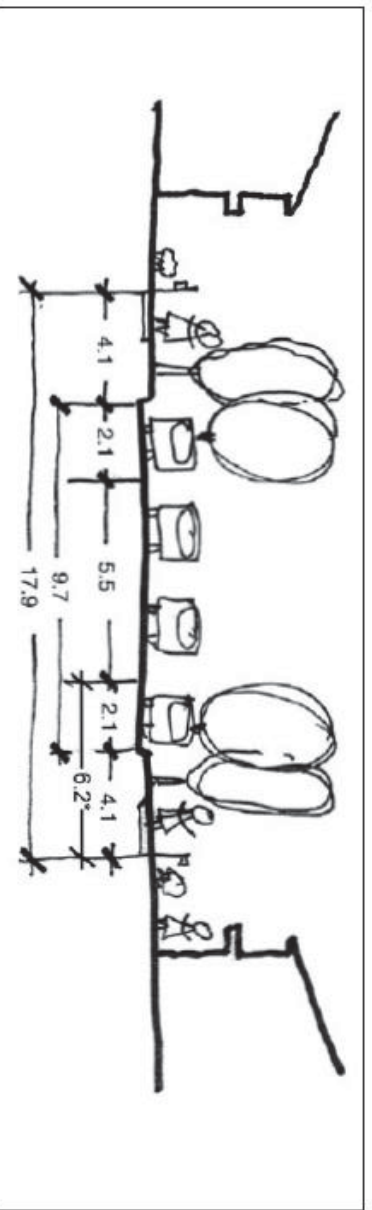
Access Street B Indicative Cross Section (Liveable Neighbourhoods 2009)
